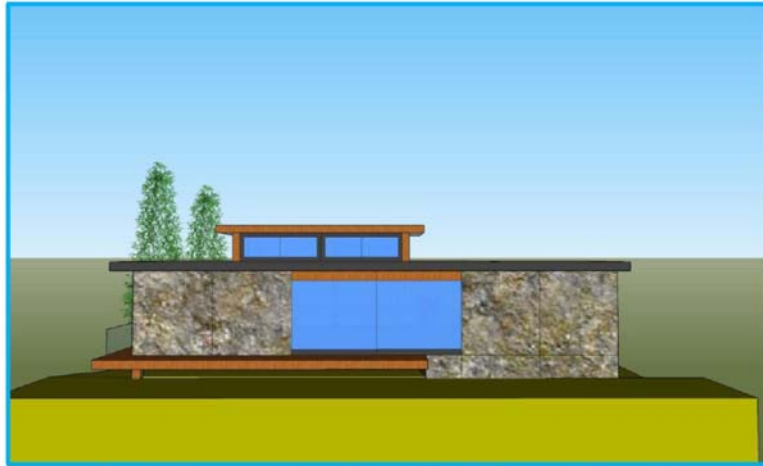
Proposed House Design, Rear Elevation, (Appendix I)
